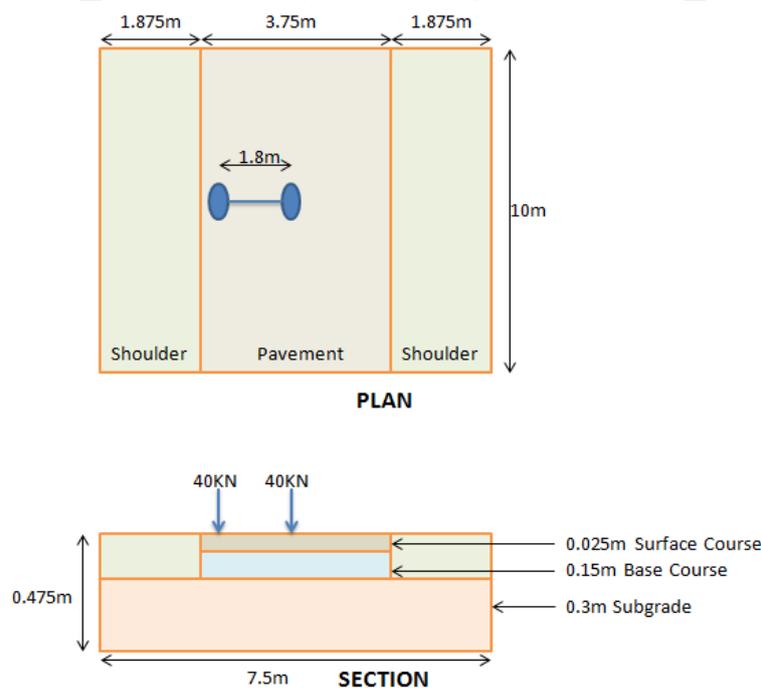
Geometrical dimensions of the PLAXIS 3D model
